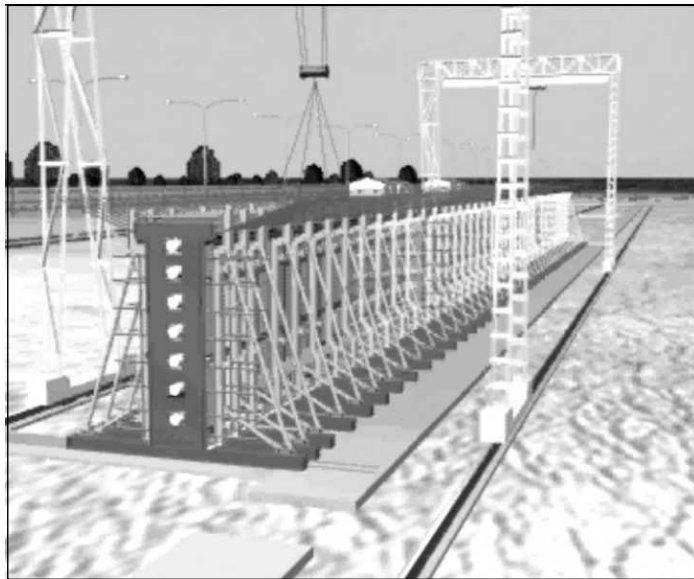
Another View of Girder Casting Arrangement at Precast Yard.
